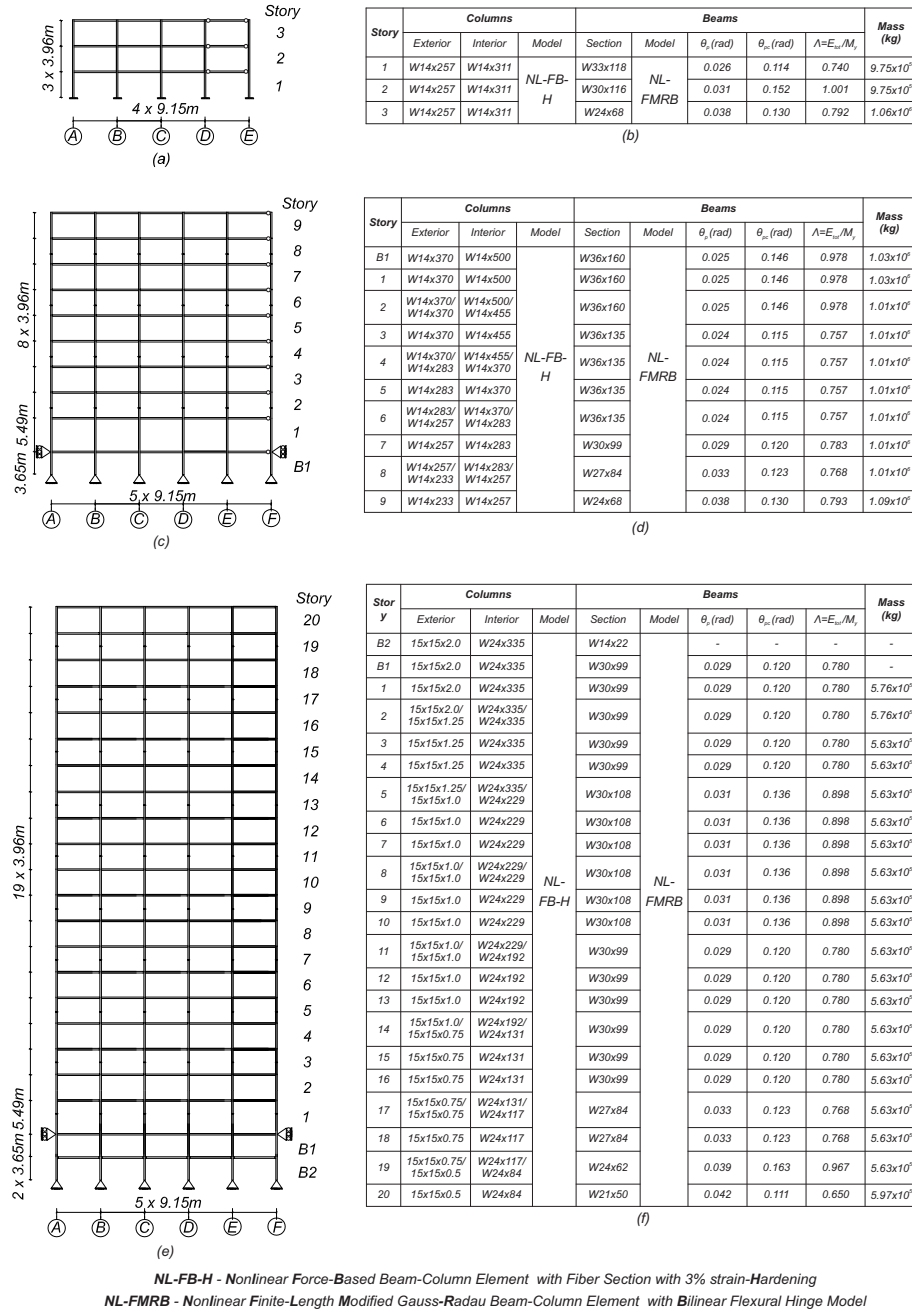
Two-Dimensional Models of Steel Moment Resisting Frames Buildings in Los Angeles : (a) LA3 Building; (b) LA3 Sections, Model Parameters, and Floor Masses; (c) LA9 Building; (d) LA9 Sections, Model Parameters, and Floor Masses; (e) LA20 Building; (f) LA20 Sections, Model Parameters, and Floor Masses
